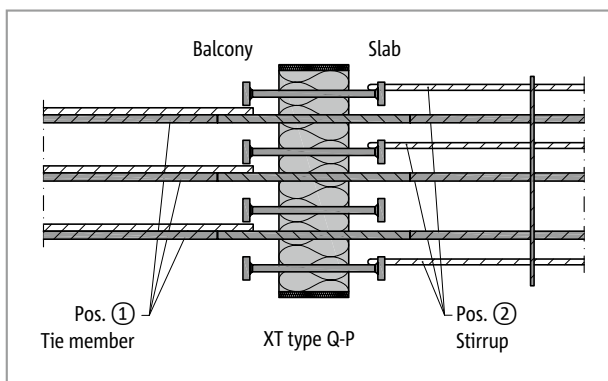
Schöck Isokorb® XT type Q-P: Detail 1; Reinforcement connection tie member
